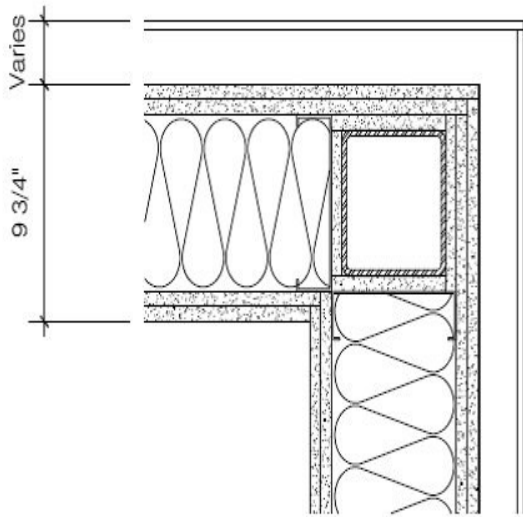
Corner connection details (Garrison and Tweedie 2008)
